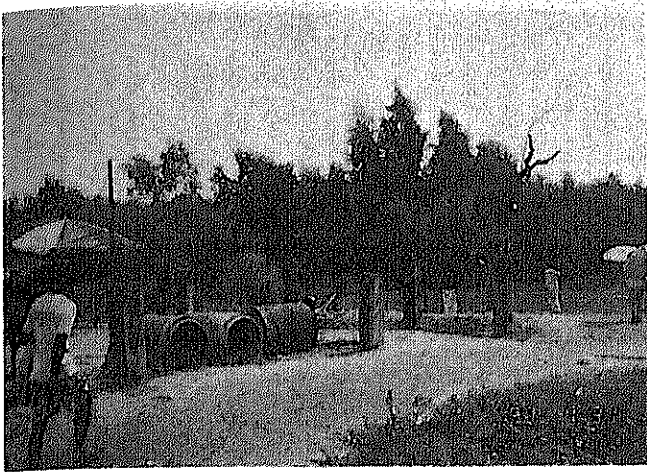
Substructure for widening of Magsaysay Bridge
